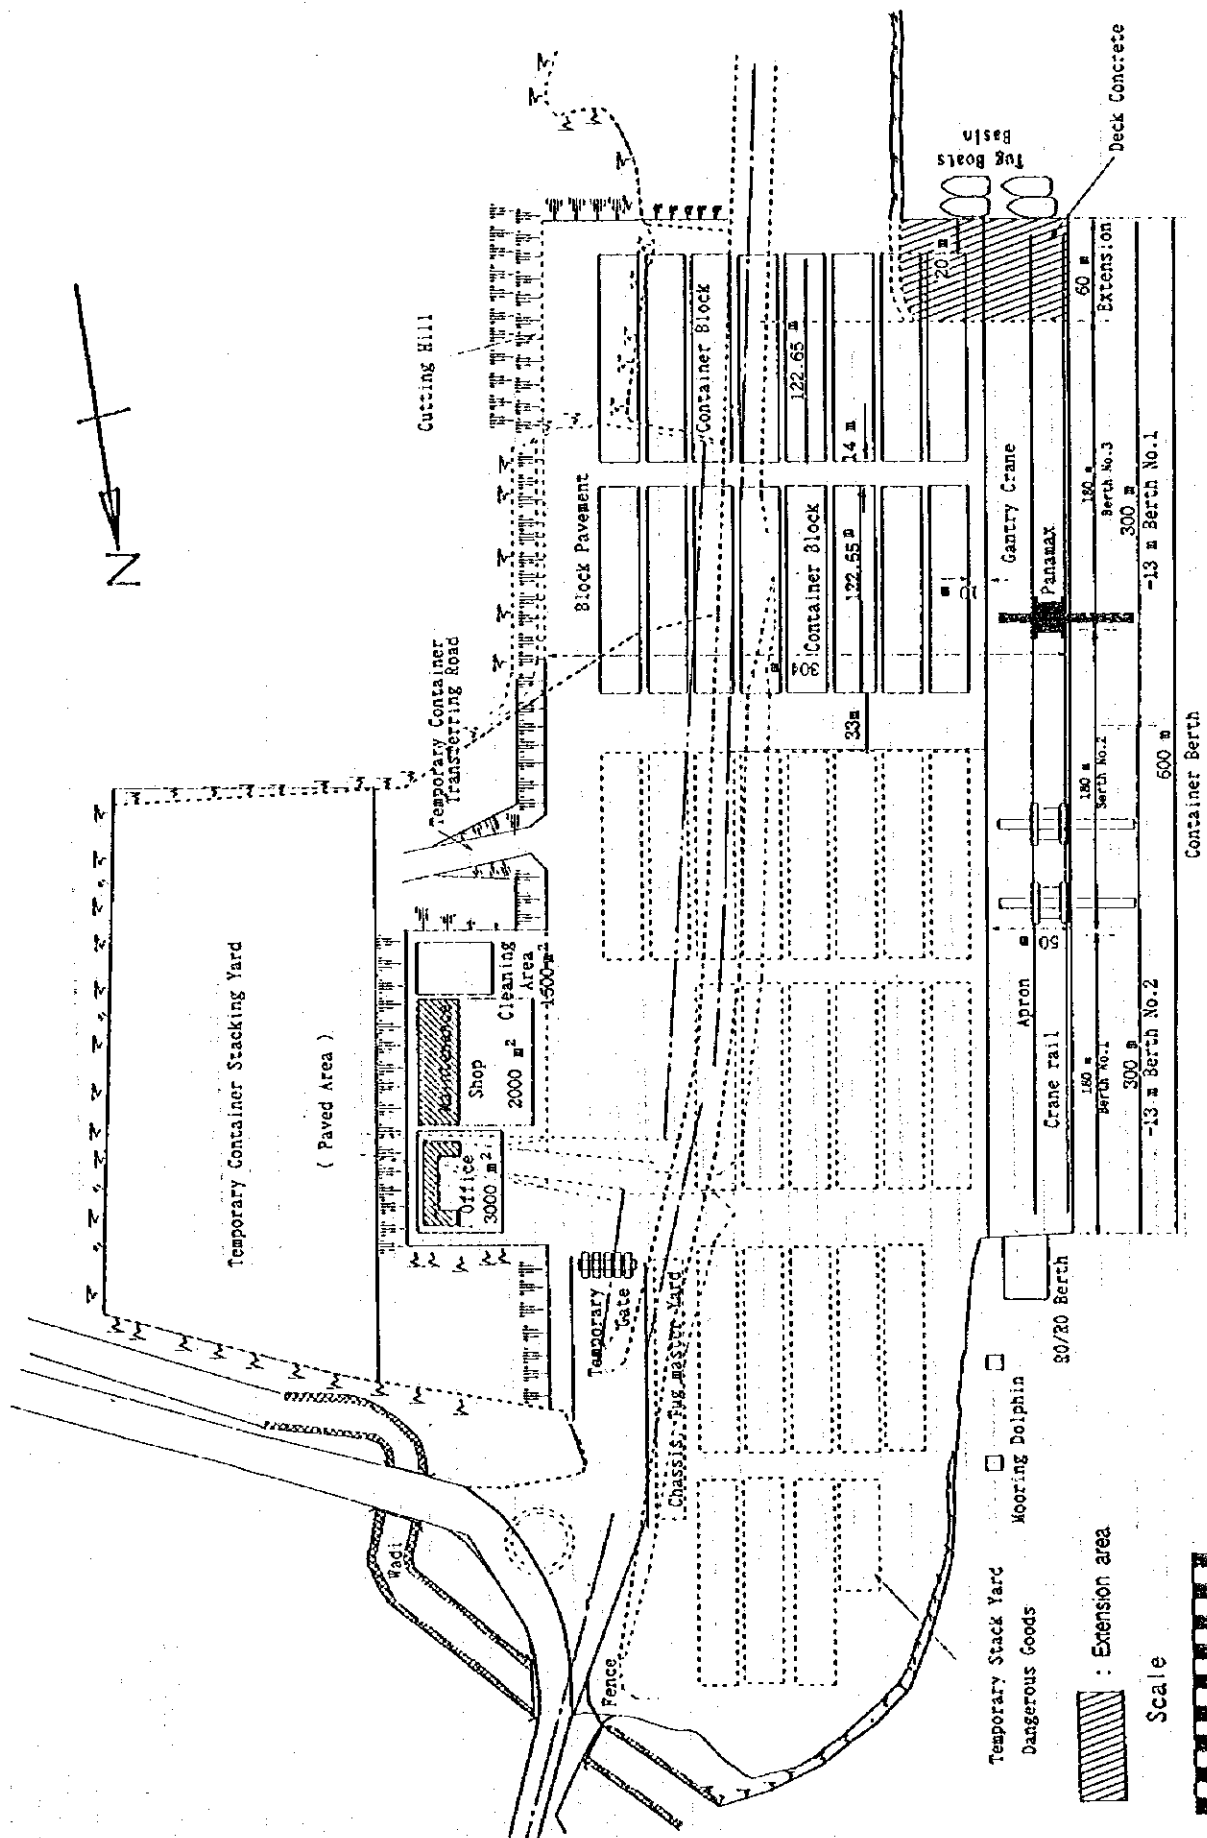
Proposed Short-Term Improvement Plan of Container Terminal
